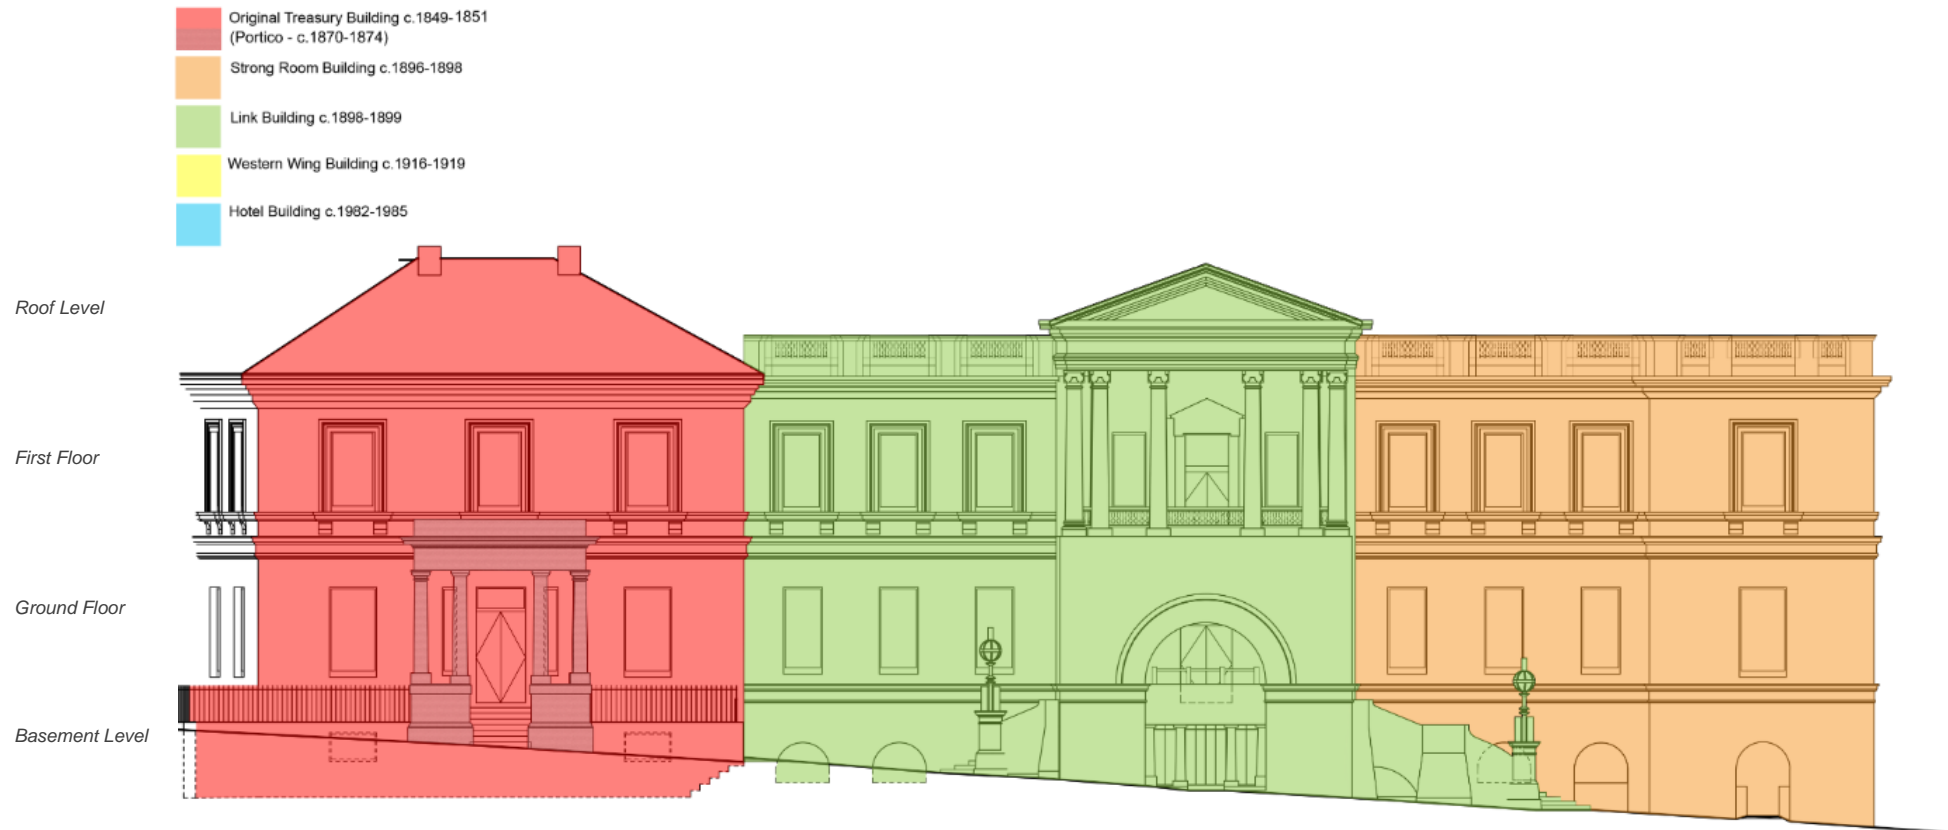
Extract of 'as built' plans showing period of construction – Macquarie Street elevation
